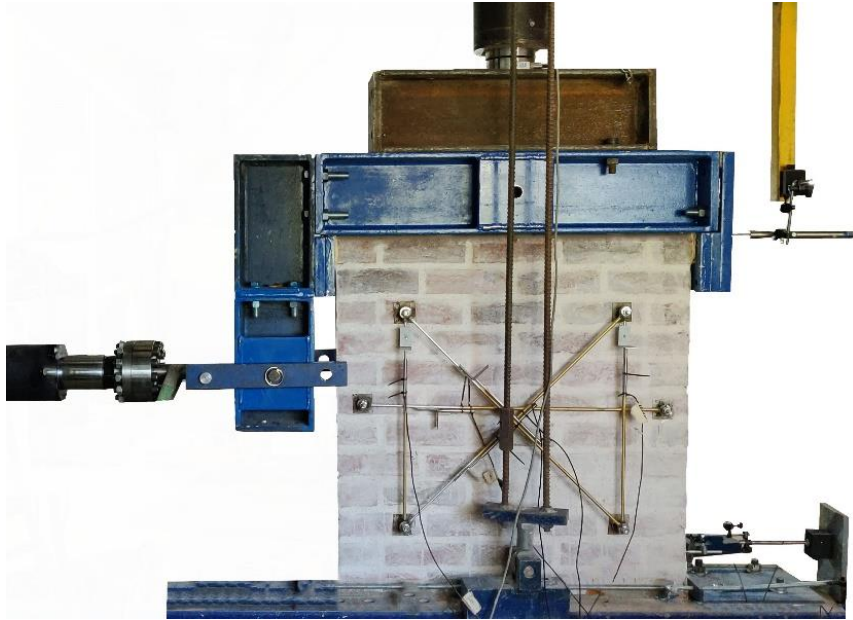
Setup used for in-plane cyclic loading of masonry specimens (Image from the laboratory, UMinho)
